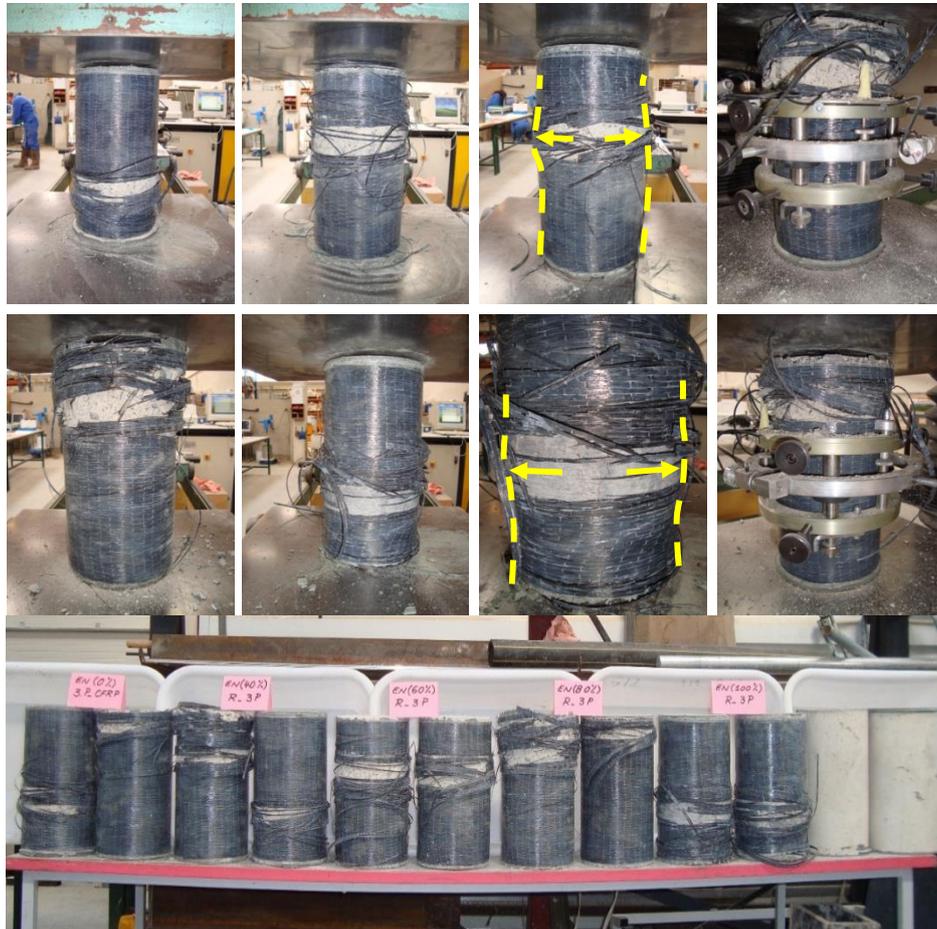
Typical failure modes for some pre-damaged and undamaged strengthened specimens
